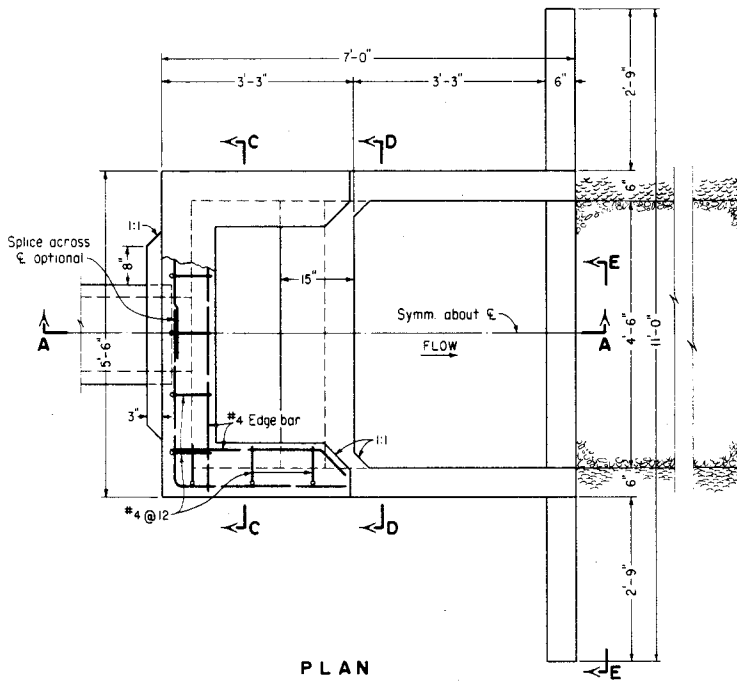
Type 1 baffled outlet. 103-D-1340
